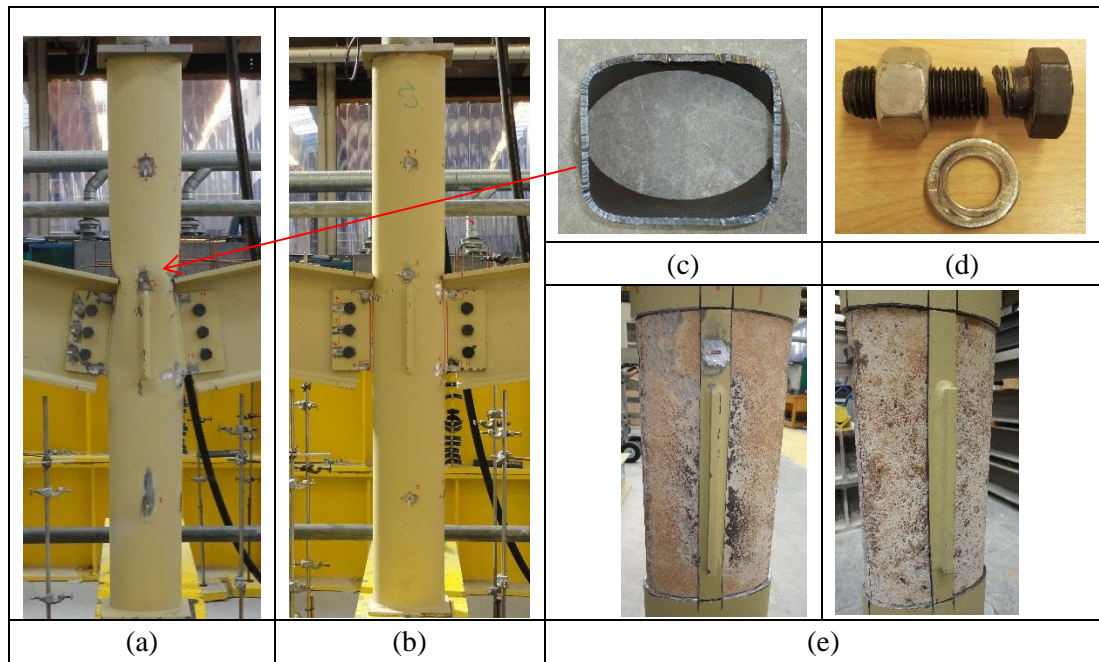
Failure of Type-A connections: (a) Joint-A; (b) Joint-AC; (c) Worst section of Joint-A; (d) Bolt failure of Joint-AC; (e) Core concrete of Joint-AC
